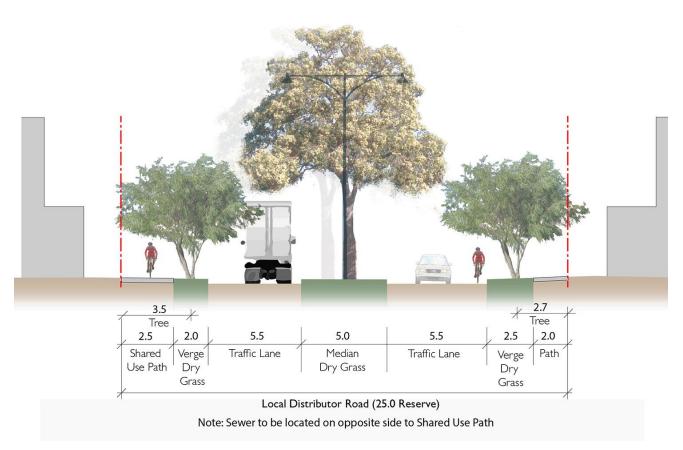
Proposed Road Reservation Width and Cross-Section for the Local Distributor Road
